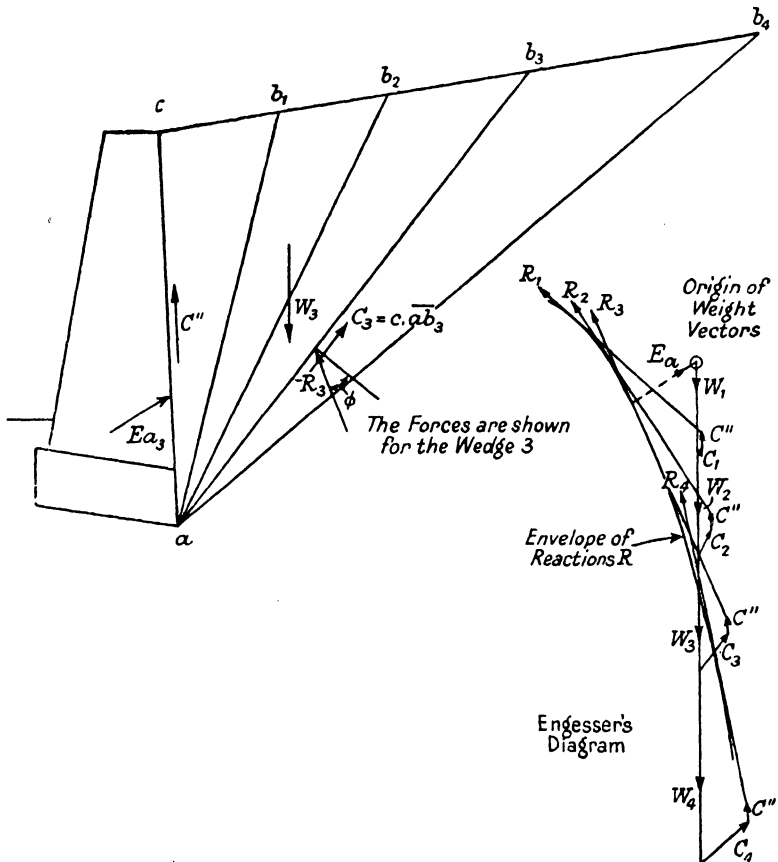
Engesser's graphical method for determination of active pressure behind a retaining wall.
